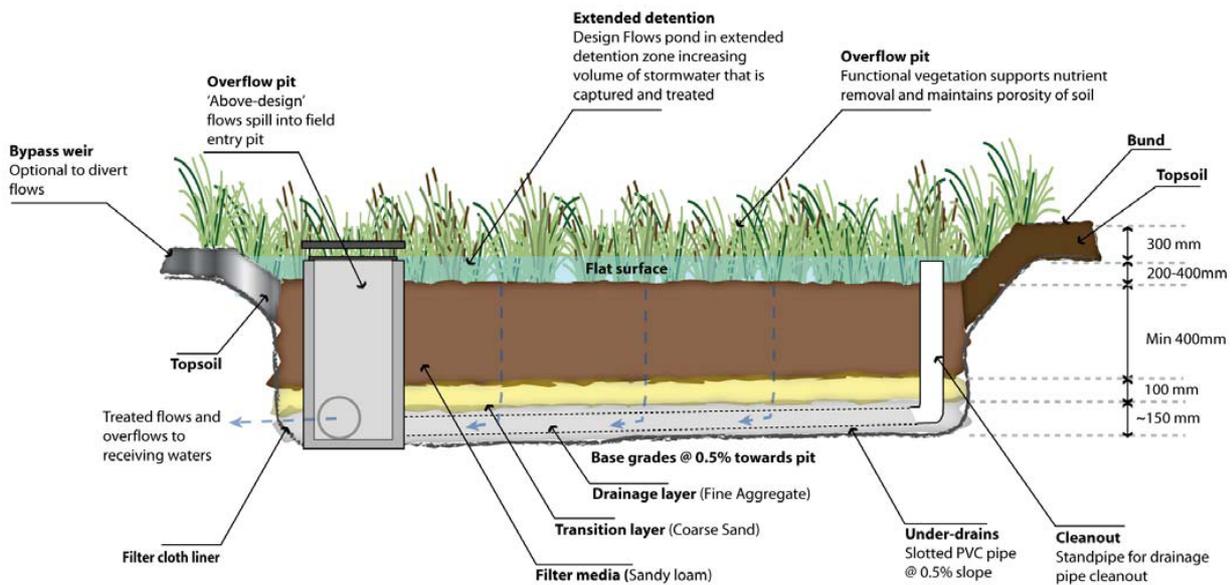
Typical cross section through a bioretention system (with under-drains)
